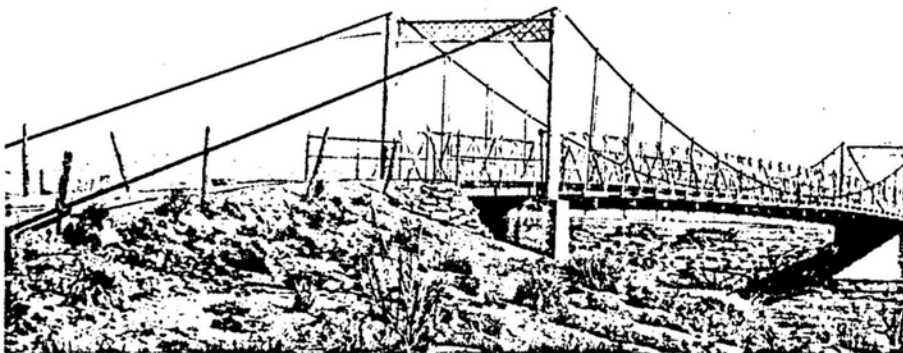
Lake Arthur Suspension Bridge Over the Pecos River. This bridge was built as a county project about 1907 and served the area until its failure in 1956. (Highway Department Bridge Files, Inactive)
